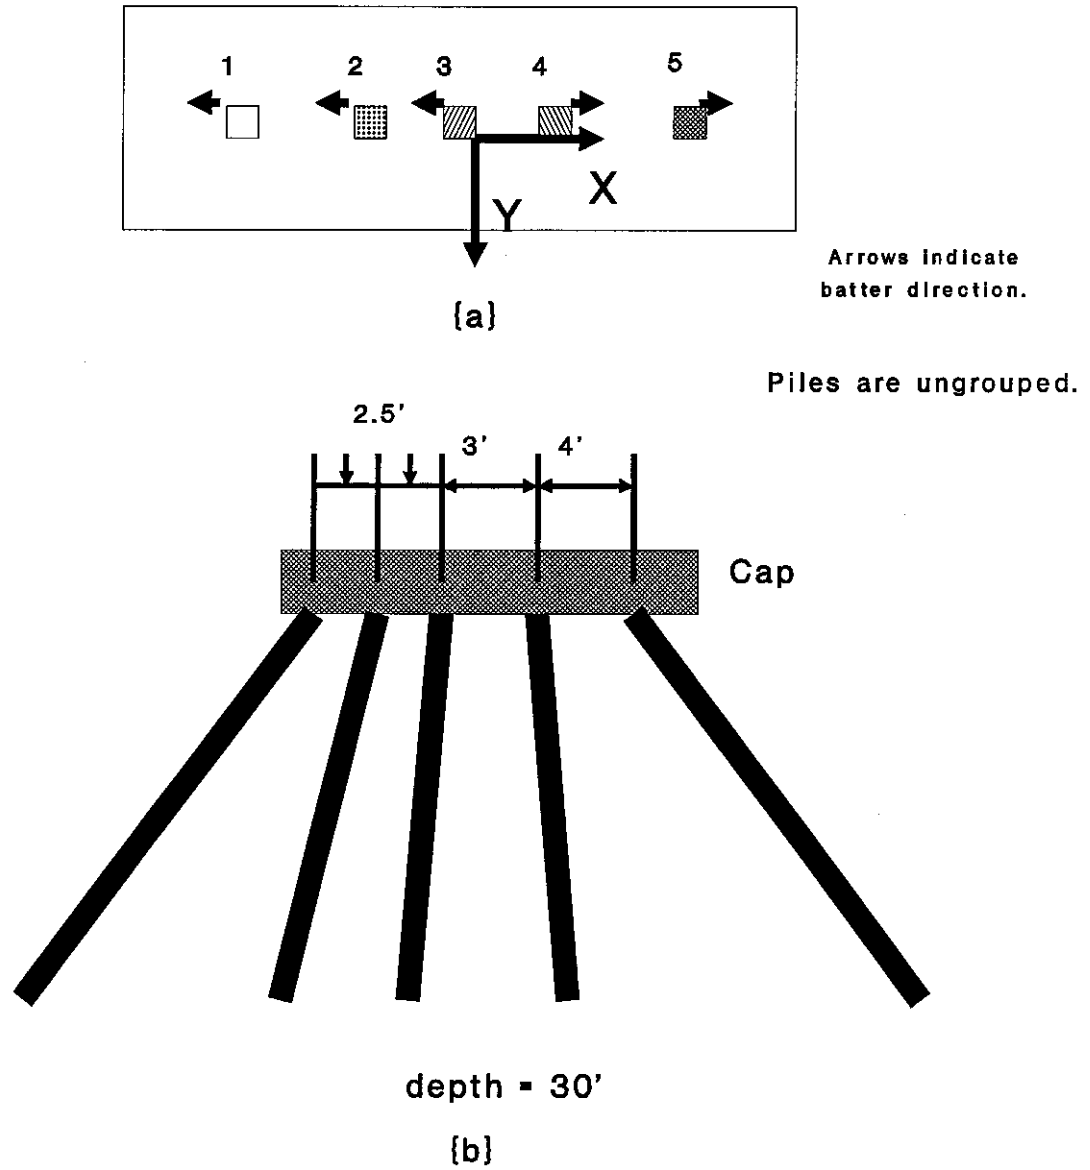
Initial pile layouts for examples 1.4 and 1.5.
